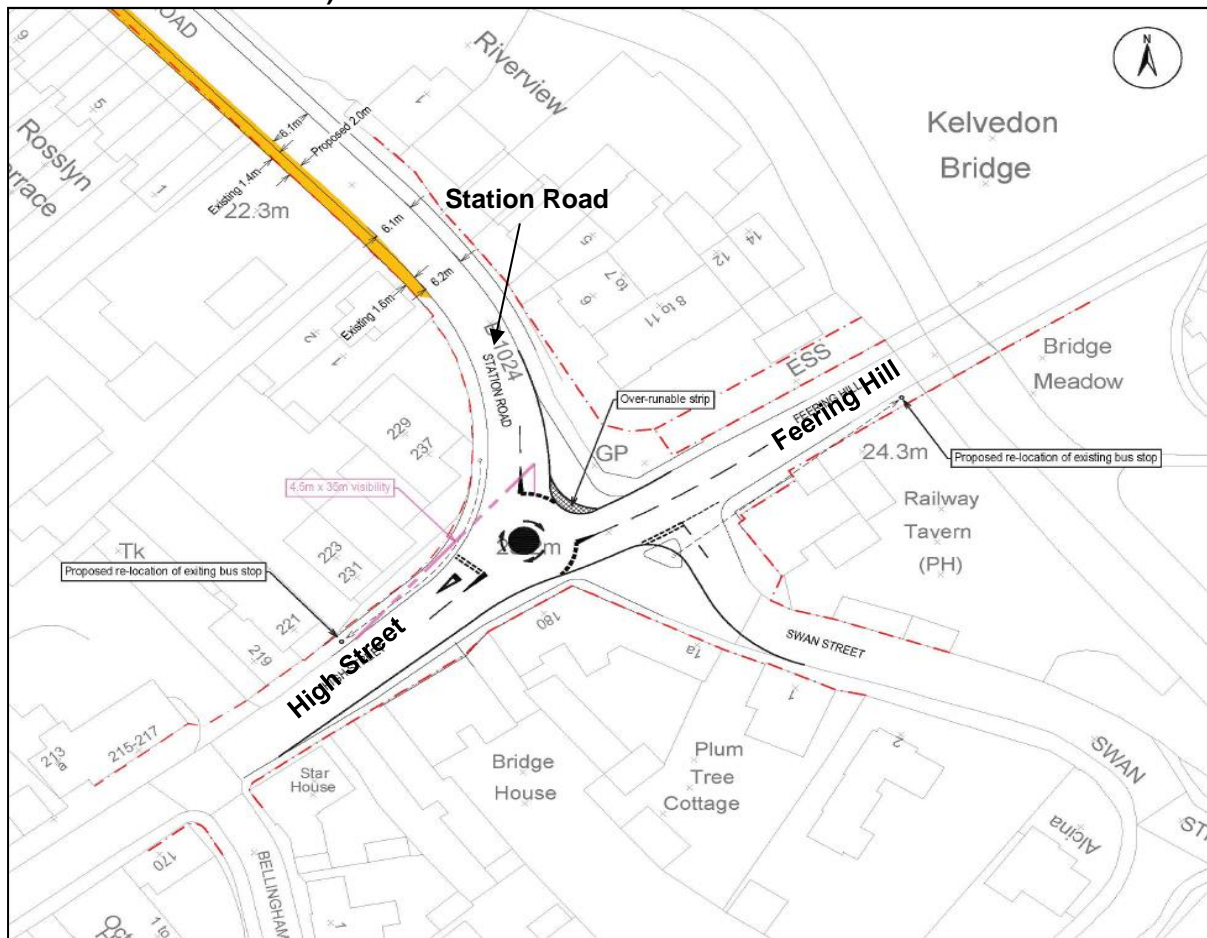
Proposed B1024 Station Road/B1024 High Street mini-roundabout (Source: Braintree District Council)
